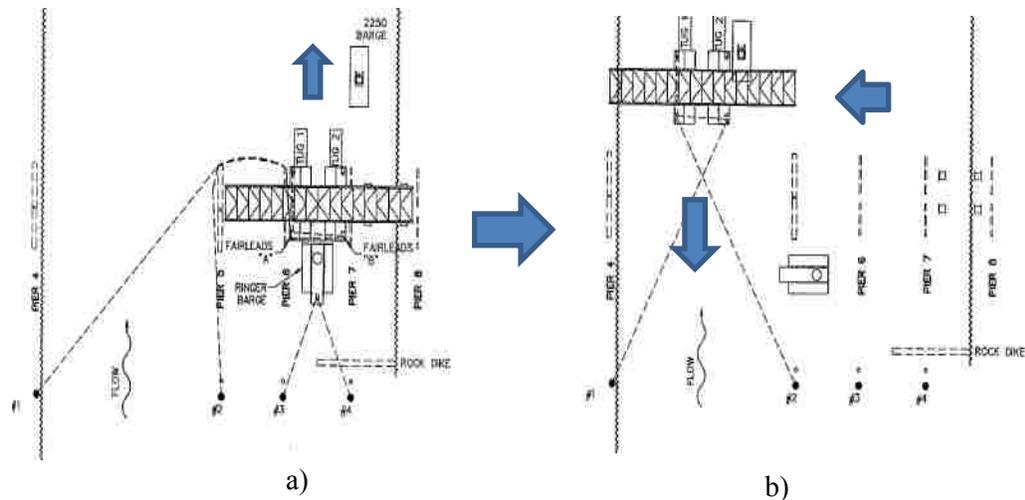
Schematic showing transport of Rte 364 Bridge. From temporary position a) to directly downstream of final position b). Note four anchor points in bottom of schematic. Barges and bridge were winched into place
